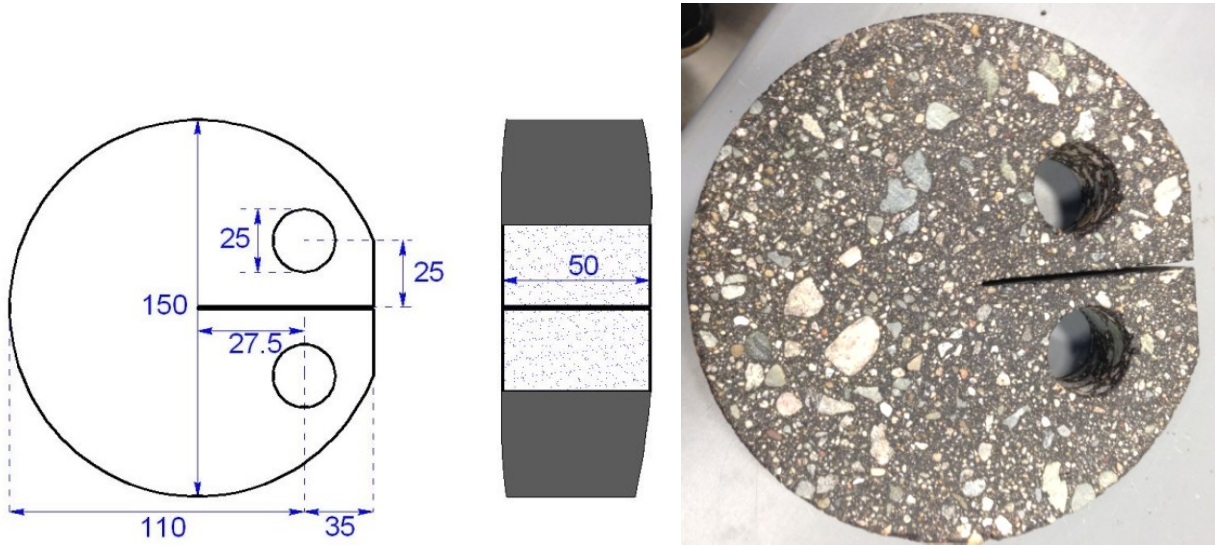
(a) Disk-shaped compact tension specimen geometry (dimensions in mm);
